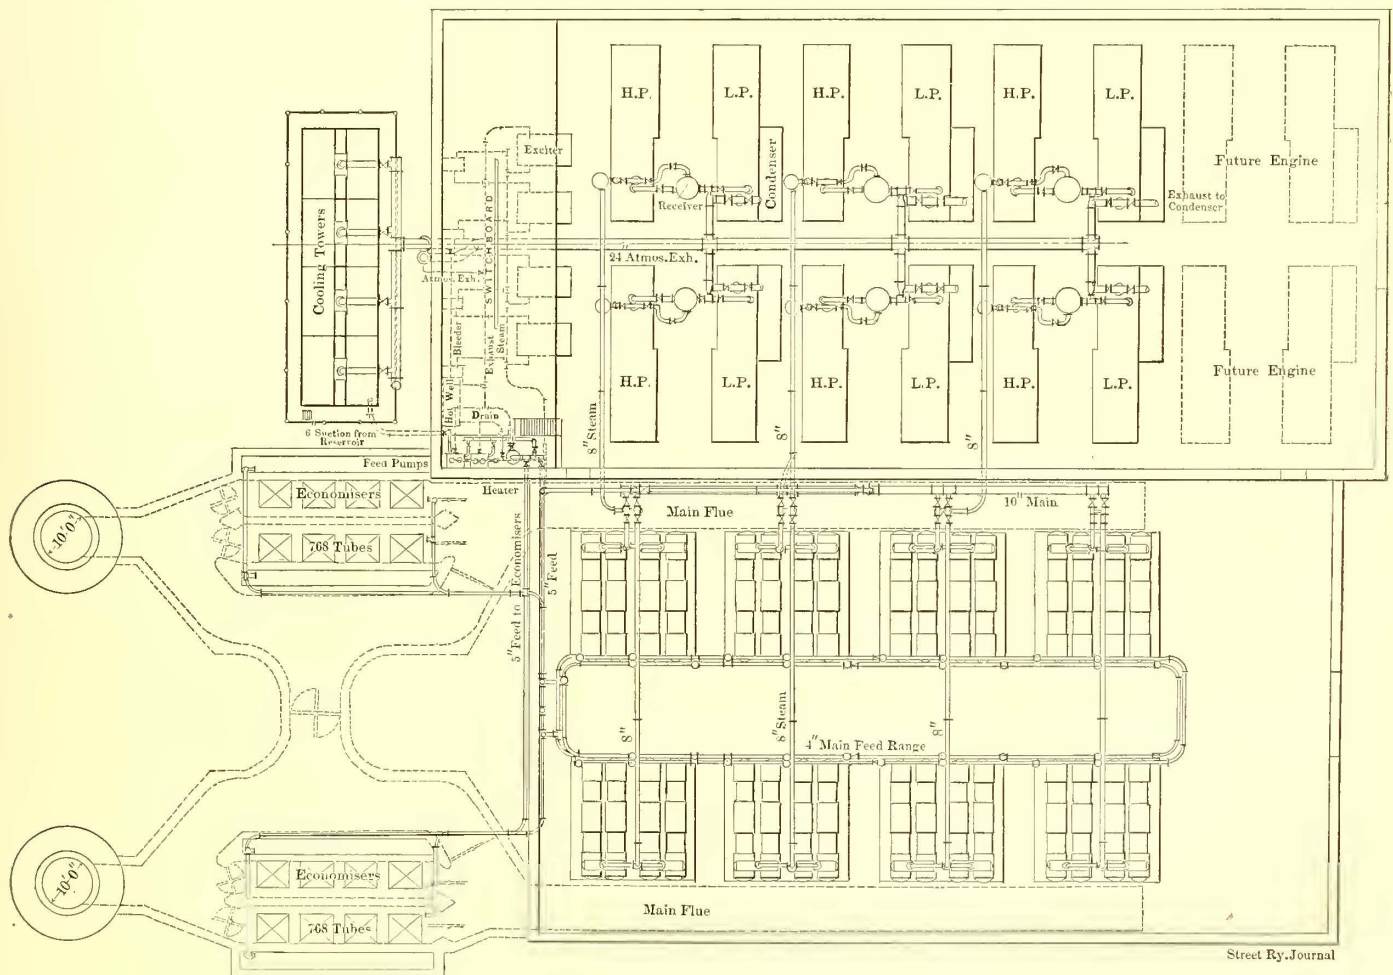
PLAN OF GENERATING STATION—CENTRAL LONDON RAILWAY
